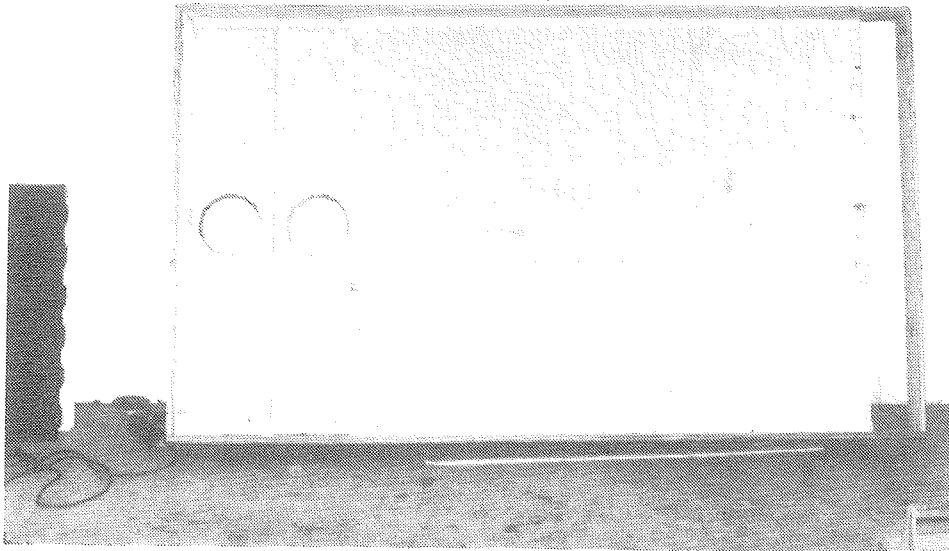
The MF-panel before mounting of the trapezium corrugated metal sheet.
